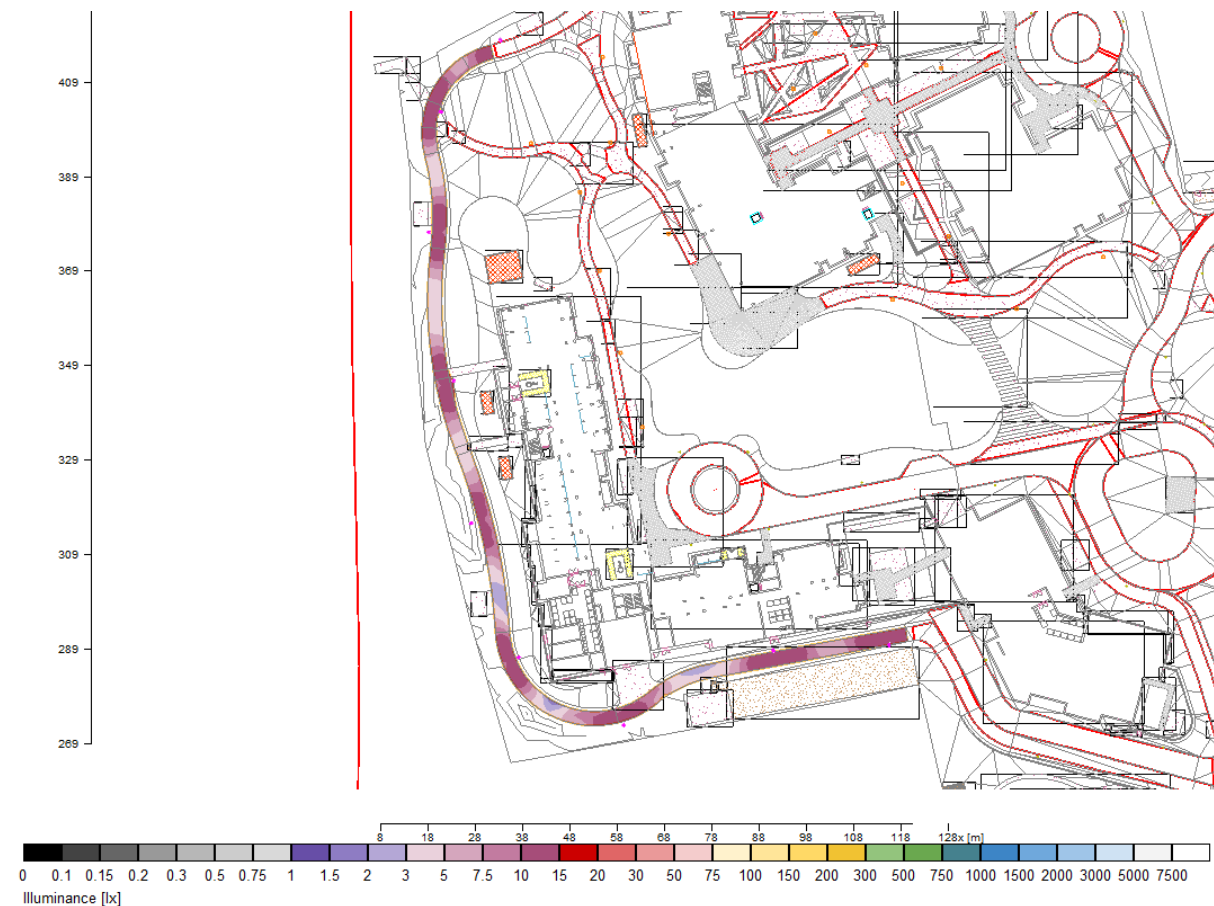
Illumination Levels to Footpath Around Site
